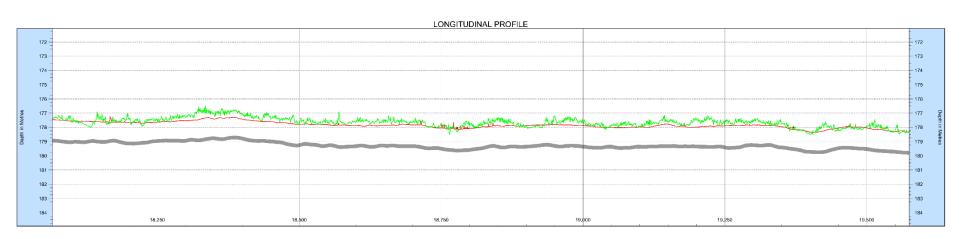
PL4556 As-built alignment sheet KP18.065 to KP19.575
